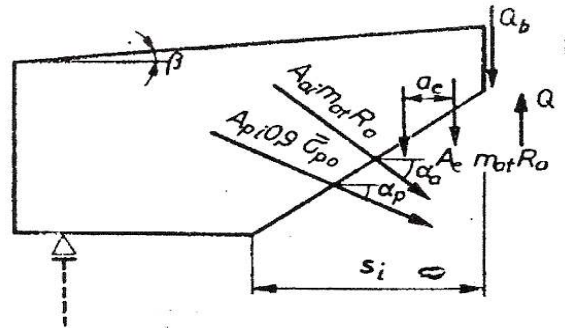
Inclined cracked section. The limit strength calculation for the shear force. [1.4]
